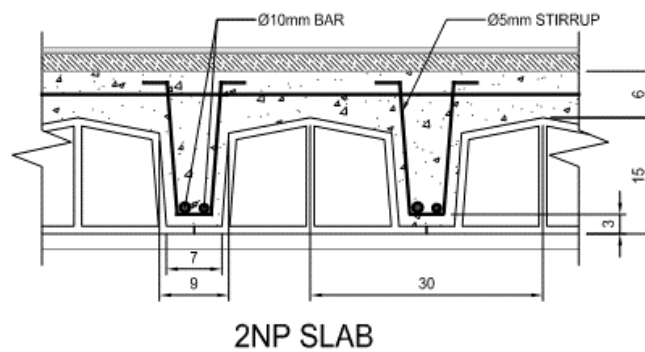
Level 2NP Slab Cross Section with dimensions in centimeters [16]
